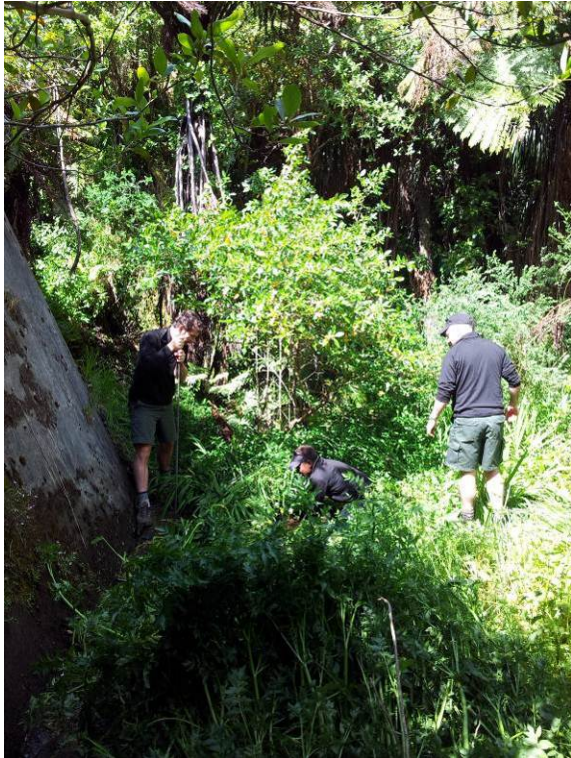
Vegetation cover on dam toe looking toward left abutment.
